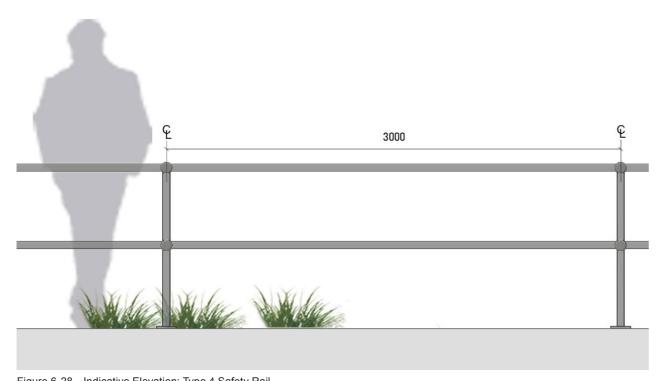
Indicative Elevation: Type 4 Safety Rail Scale 1:25 @A3
